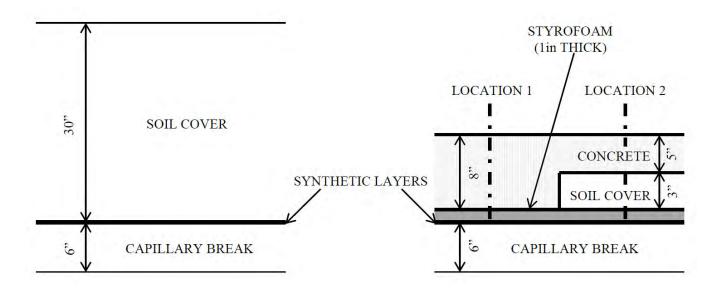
and 1b – (a) Existing Conditions, (b) Future Plaza Slab-on-Grade
